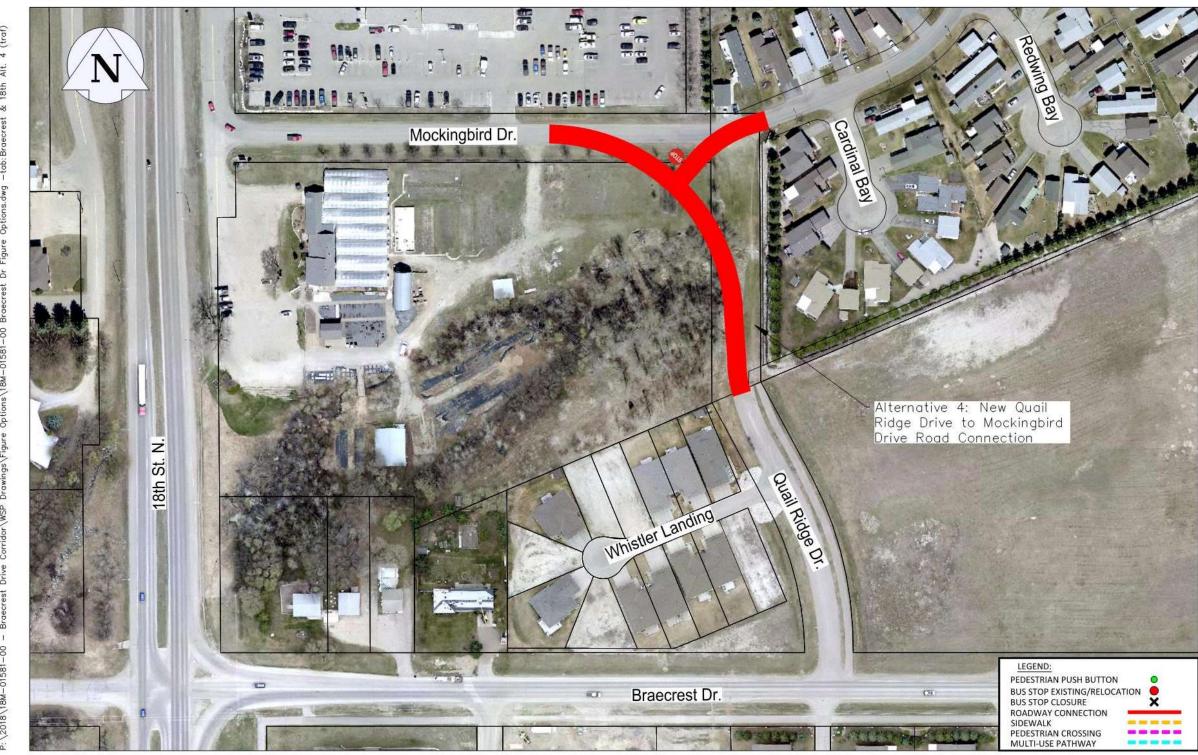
Braecrest Drive and 18th Street North Traffic Management Alternative 4
